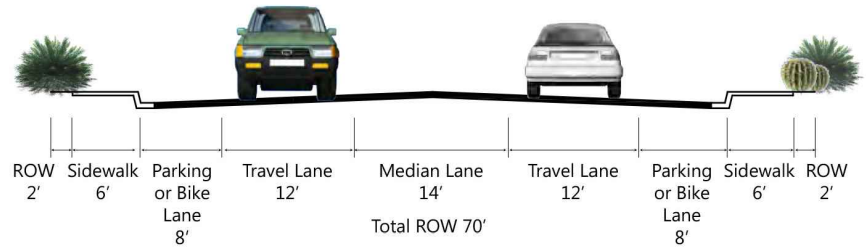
Town of Yucca Valley General Plan Roadway Cross-Sections
